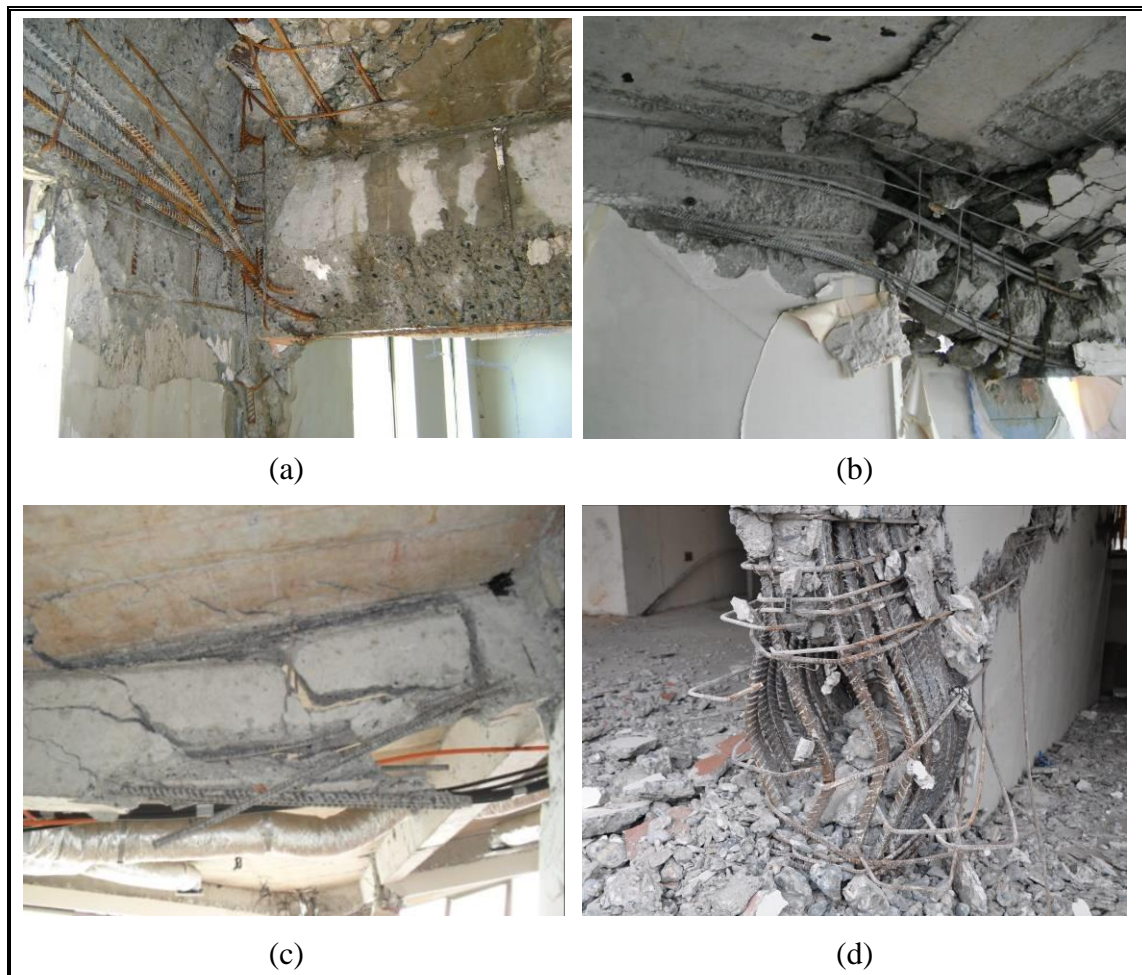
(a) Inadequate anchorage of beam-wall connection, (b) reinforcement outside of the confined area, (c) unconfined longitudinal reinforcement and lack of stirrups, (d) typical observed hooks.
